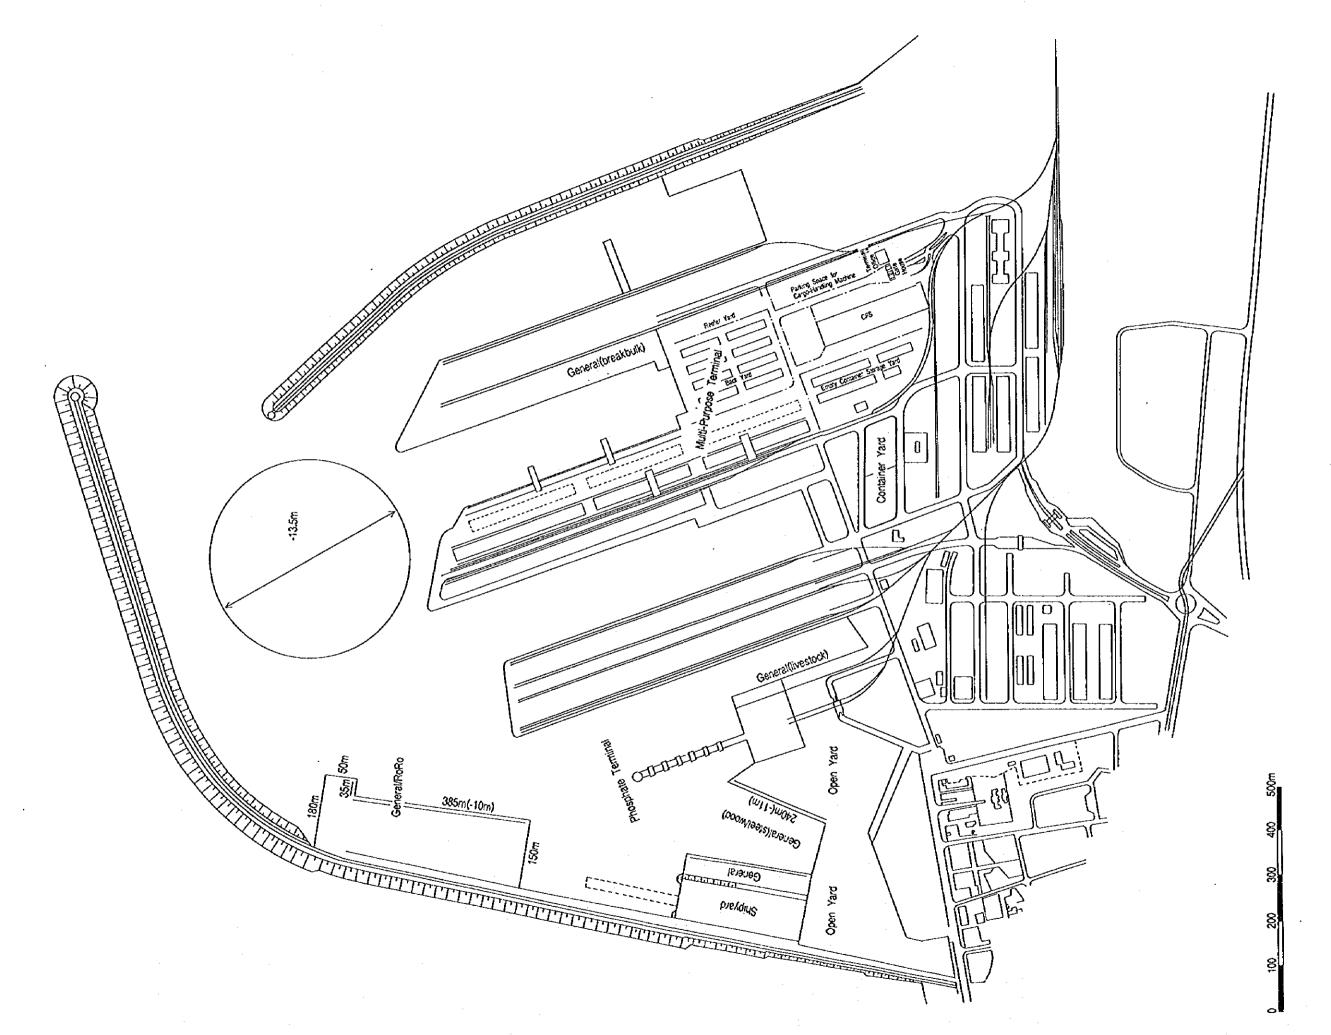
Short-Term Plan of Tartous Port
